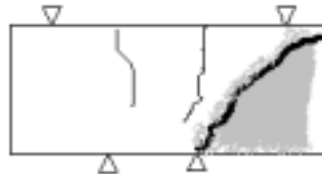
Typical failure modes for Replark® beams reinforced for flexure only.
